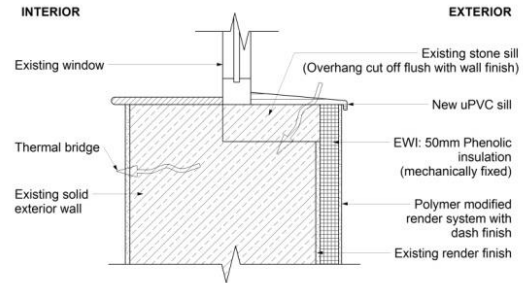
Section detail – Stone window sill (Method used for Case Study B)
